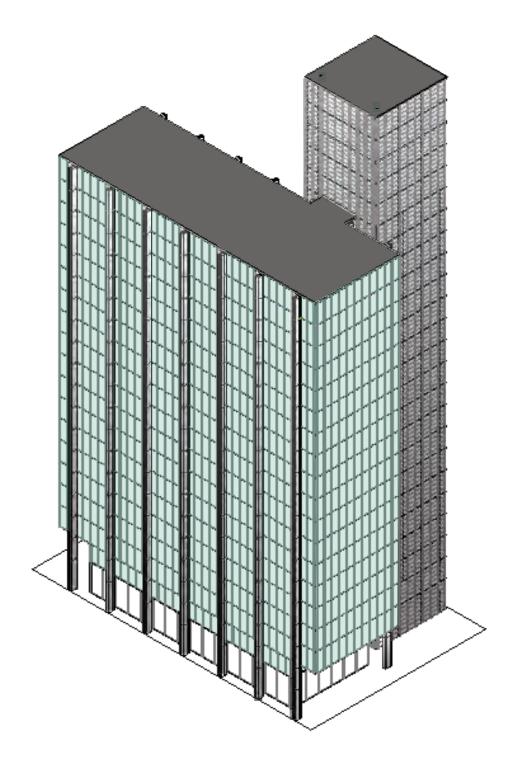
Proposed Curtain Wall. Source: Autodesk Revit, the author, 2012.
